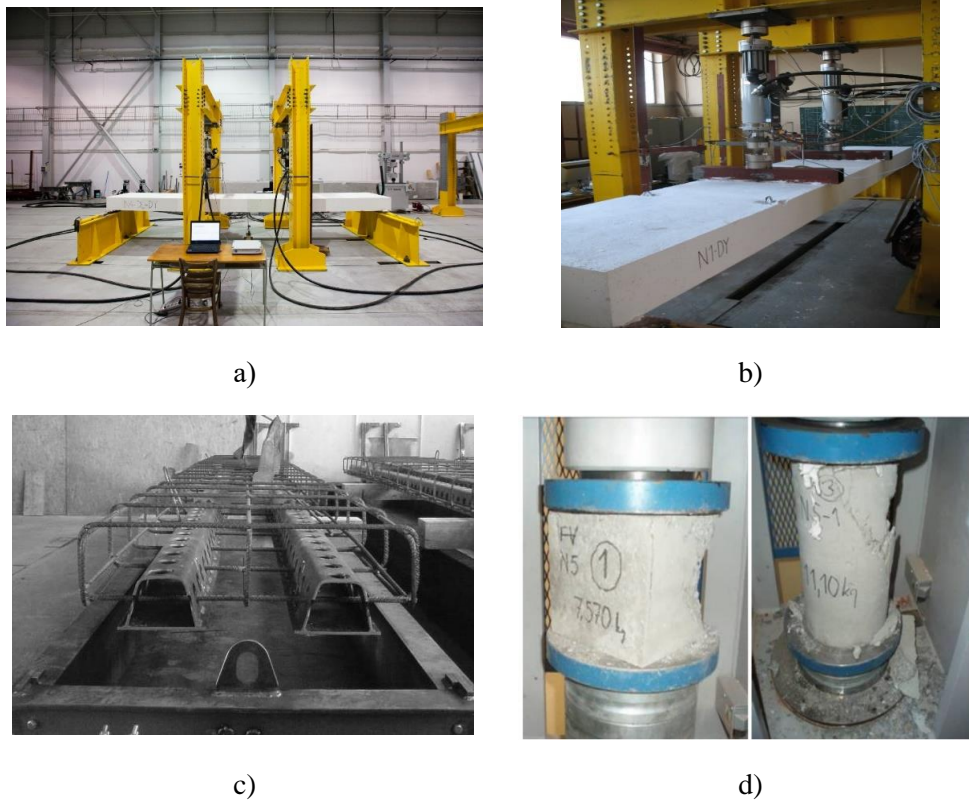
Experimental tests of a pedestrian bridge slab: general view of the stand (a) load application scheme (b), reinforcement frame (c), testing of concrete specimens for cubical and cylindrical strength (d)
